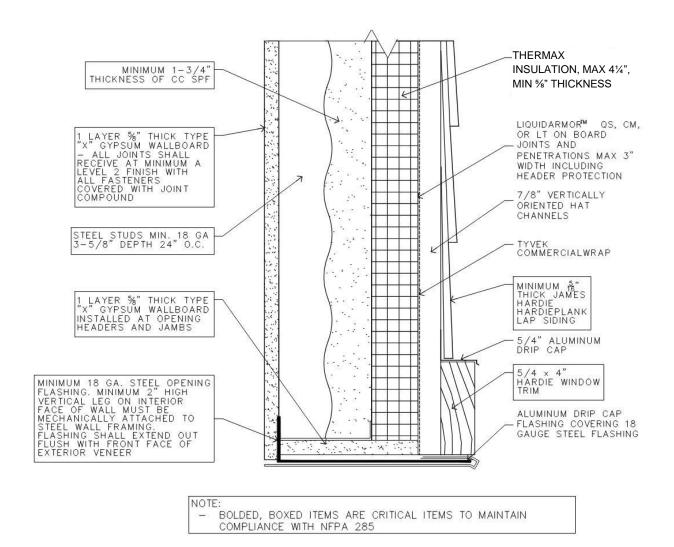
Exterior Wall Construction – Thermax and CC SPF Spray Foam
